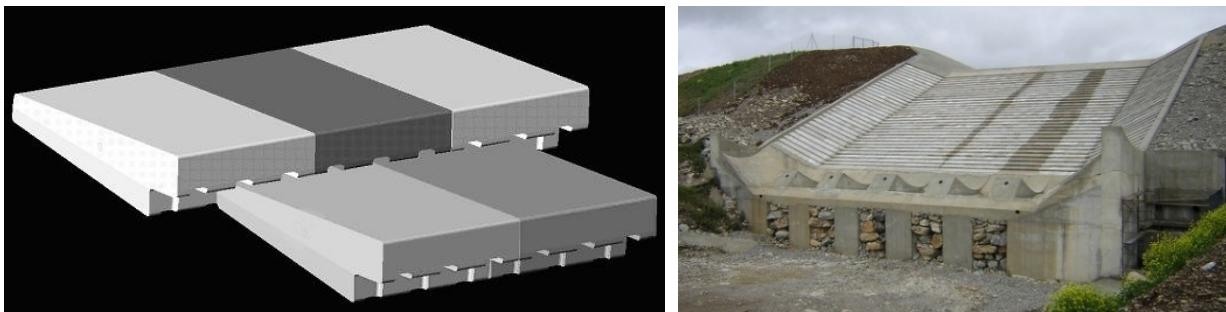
Left: Configuration of the overlap between WSBs. Right: Barriga Dam spillway (Burgos, Spain)
